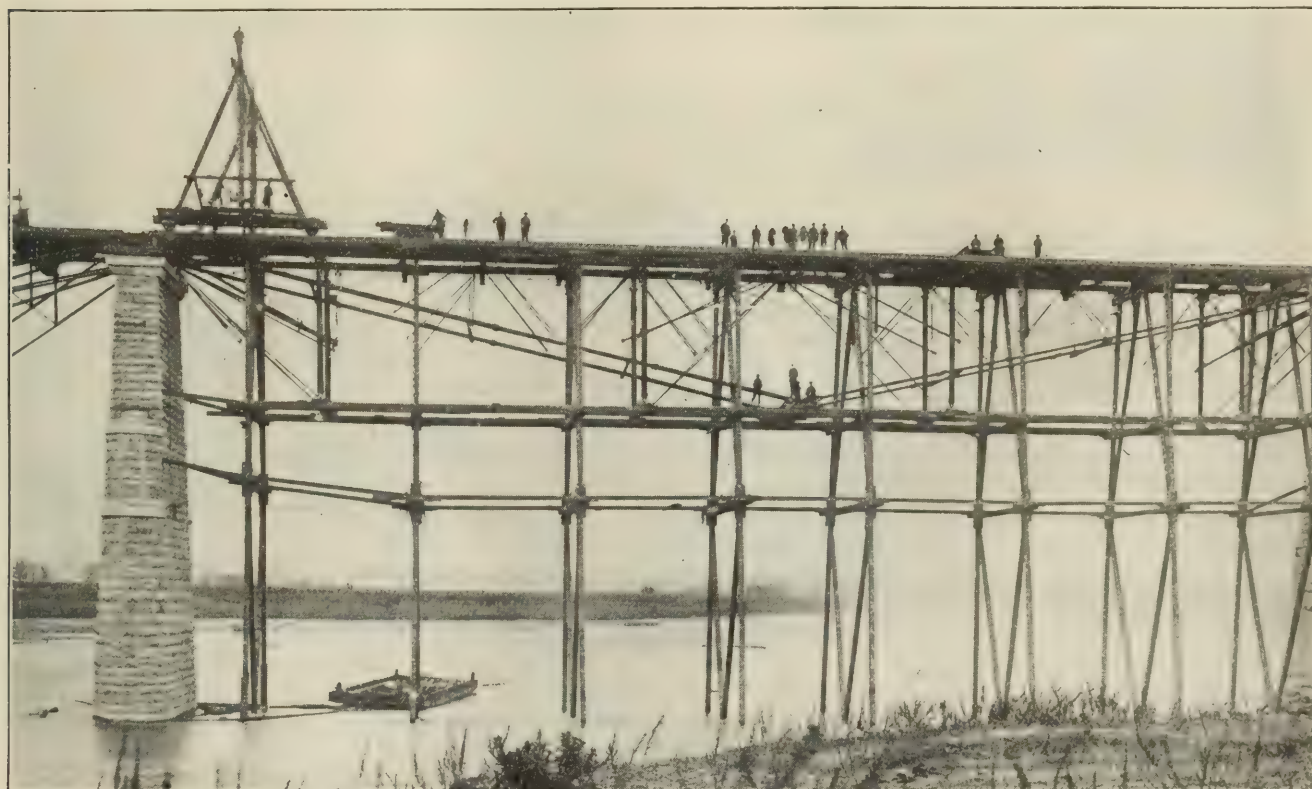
ERECTION OF ONE OF THE FINK DECK SPANS OF THE LOUISVILLE BRIDGE
